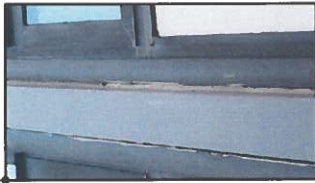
TYPICAL DETERIORATION OF JOINT BETWEEN WINDOW WALL SYSTEM AND STRUCTURAL STEEL.
